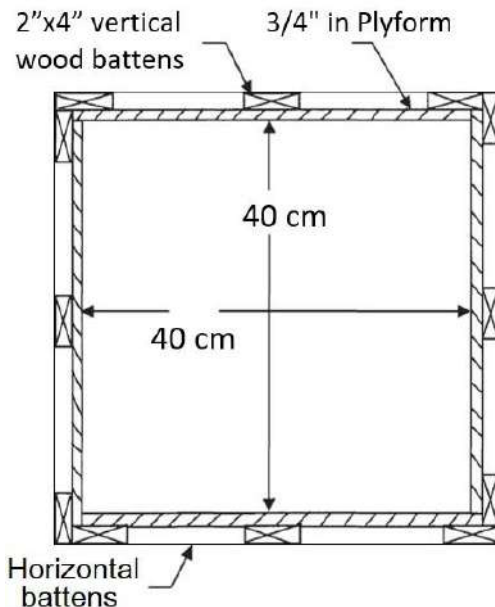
Cross-section of the wooden formwork for a 40x40 cm column
